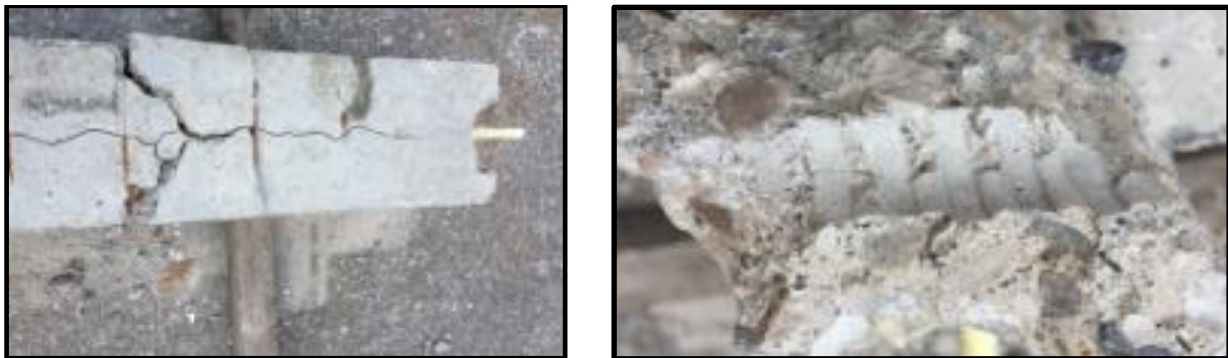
A typical bond failure for beams reinforced with prestressed ribbed GFRP bar
